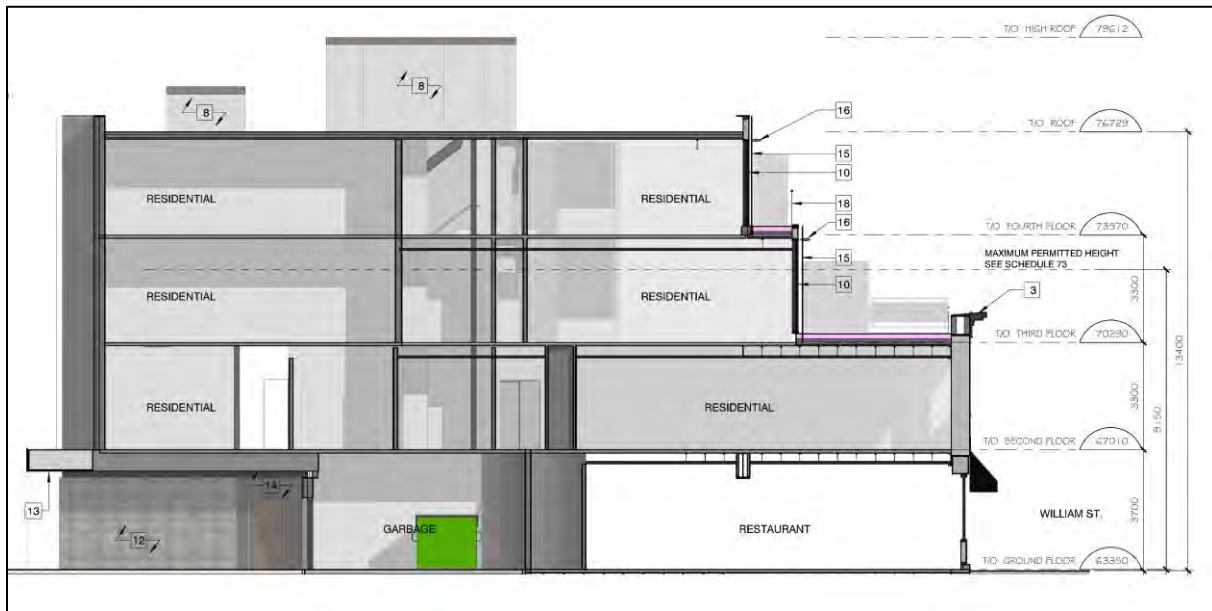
Longitudinal Section through 35-37 William Street (KWC Architects)
